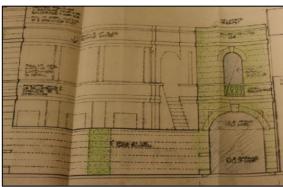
The Bates Street elevation showing the proposed changes to the first and second floor openings and additions to the rear wing. The courtyard wall was also proposed to be altered.
